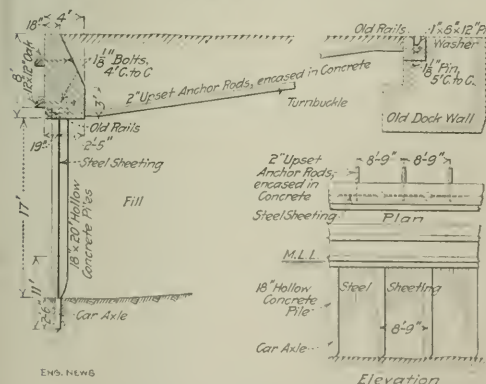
PIER WALL CONSTRUCTION WITH STEEL SHEETING HELD IN PLACE BY CONCRETE ANCHOR PILES
